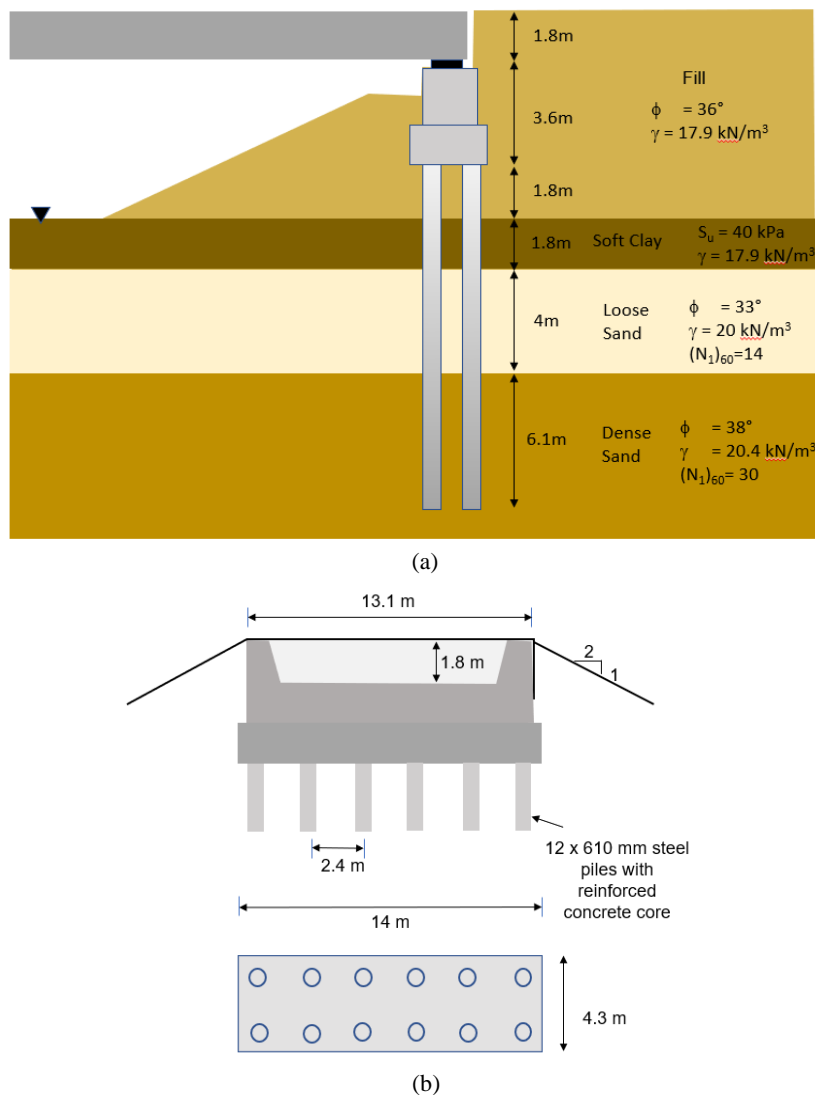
Details of the example considered in Caltrans [5]: (a) Soil profile and (b) pile configuration at the abutment.
